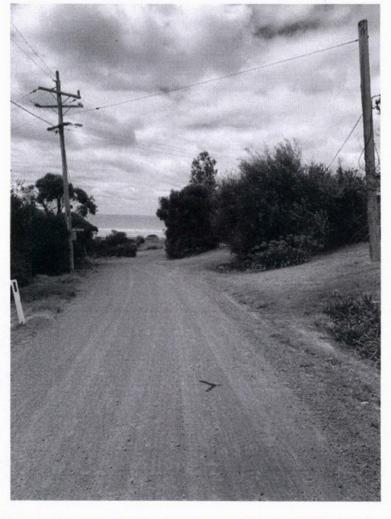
Skenes Creek Valley Road (facing south towards the beach)
